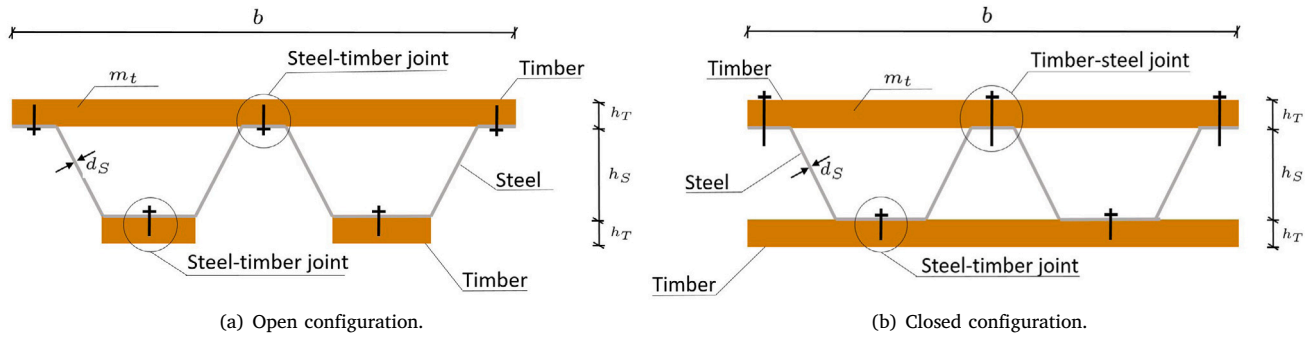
Cross-section of open (left) and closed (right) steel-timber composite element.
